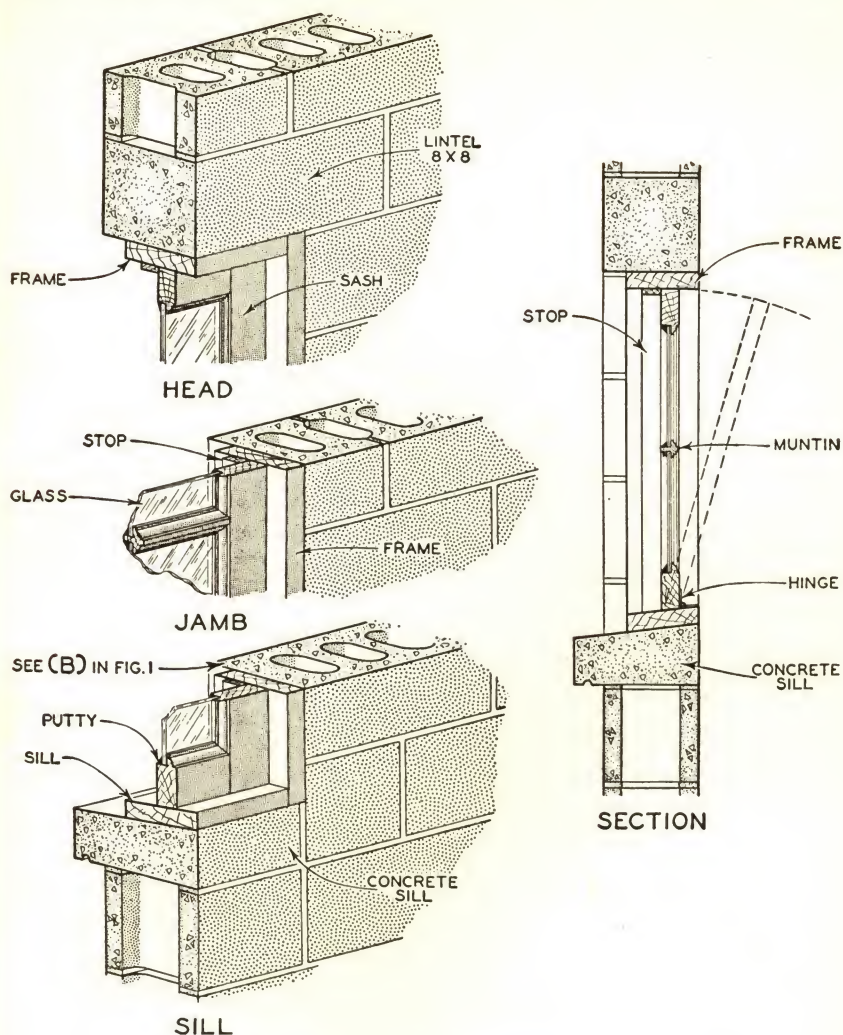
Typical Details for a Simple Window in a Concrete Block Wall
